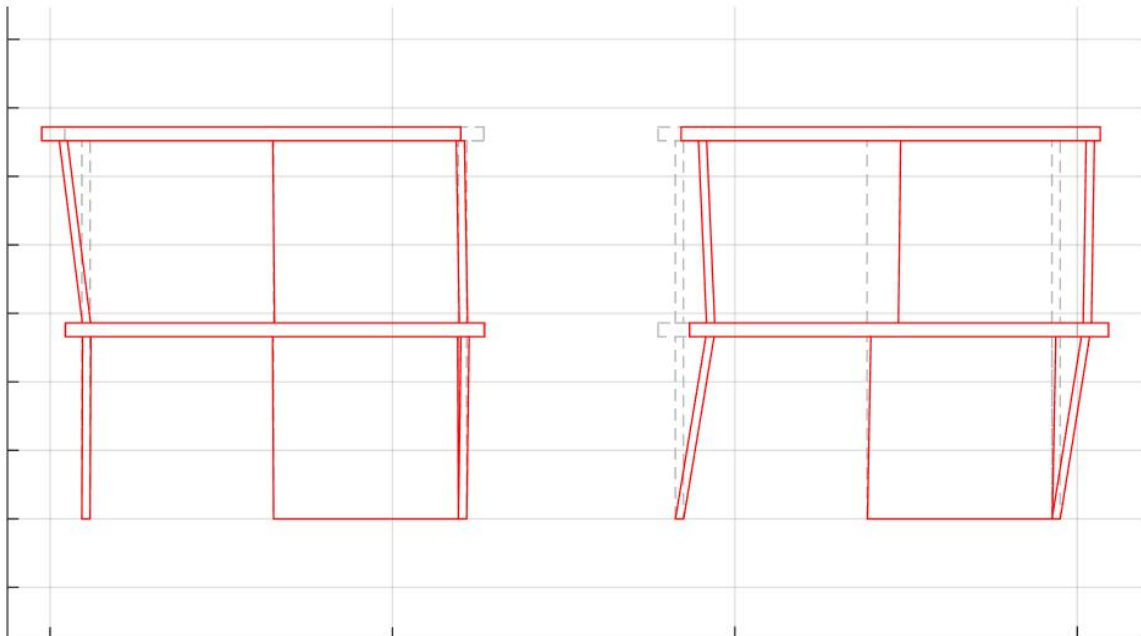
Deformed shape of EUC-BUILD4 specimen (max and min) – Test run #6.
